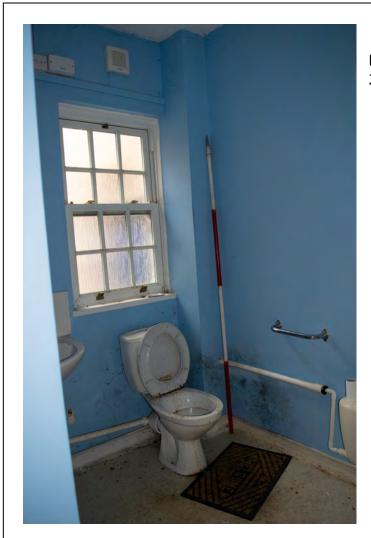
South- east facing wall of bathroom in flat 3. 2m scale.
